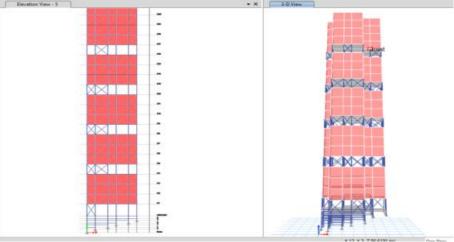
Elevation & 3D view of the building with bracing at $4^{th}+8^{th}+12^{th}$ & alternate at $(G+16^{th})$ floors on
